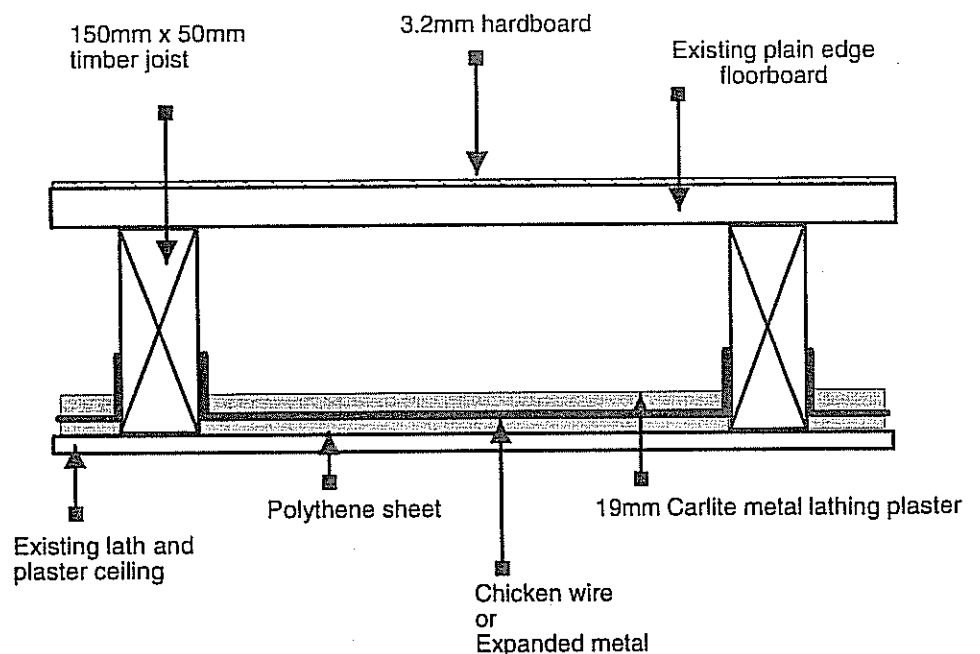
Use of plaster above an existing ceiling to provide 60 minutes fire resistance
